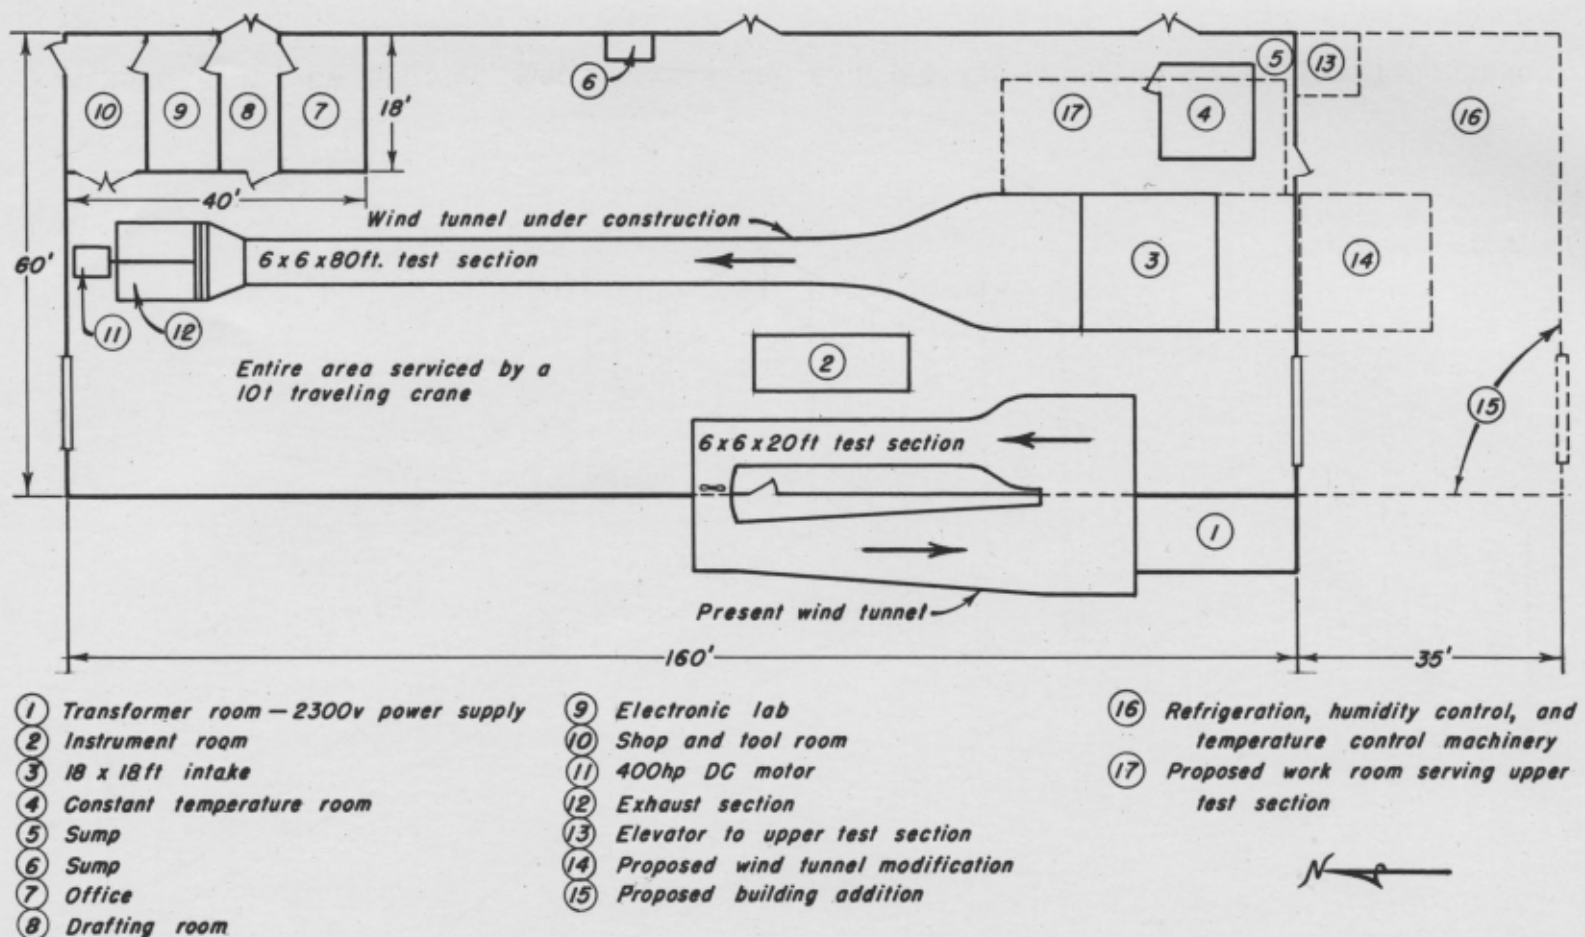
FLOOR AREA SHOWING EXISTING AND PROPOSED WIND TUNNELS AND ENVIRONMENT CONTROLLED ROOM
